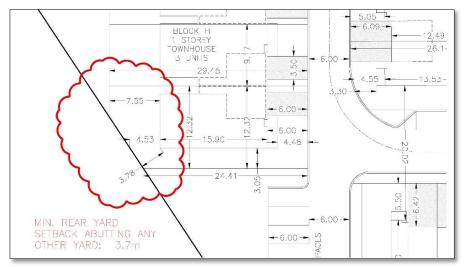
Detail 1, Variance 1 – Minimum Rear Yard Setback, IBI Group Site Plan Excerpt
